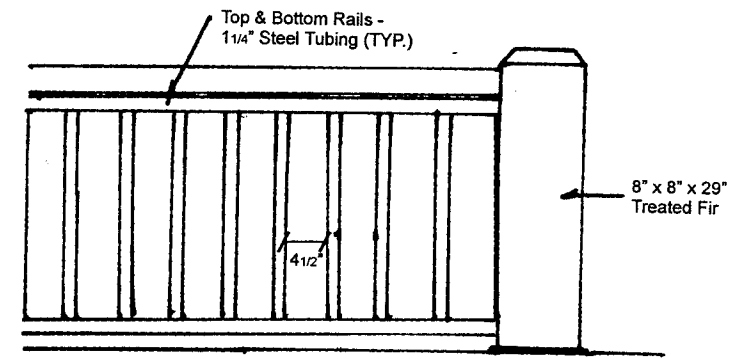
Hand Rail Detail, Courtesy of the Port of Bellingham
